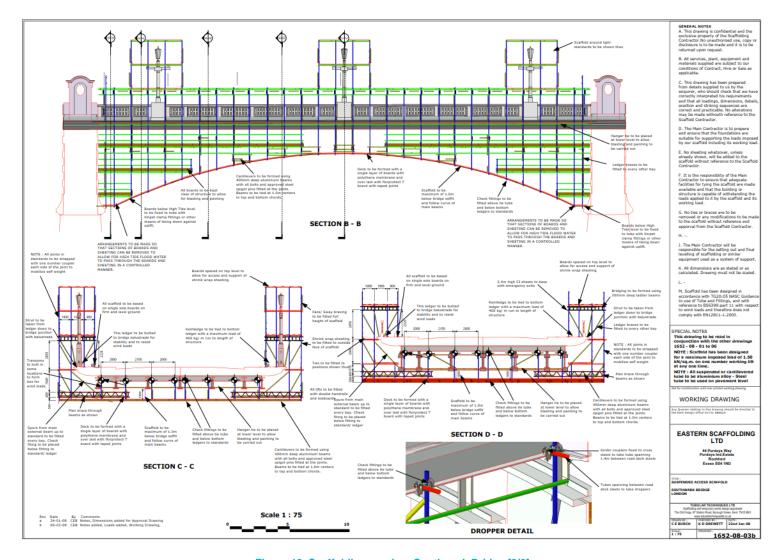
Scaffolding used on Southwark Bridge [3/6]
